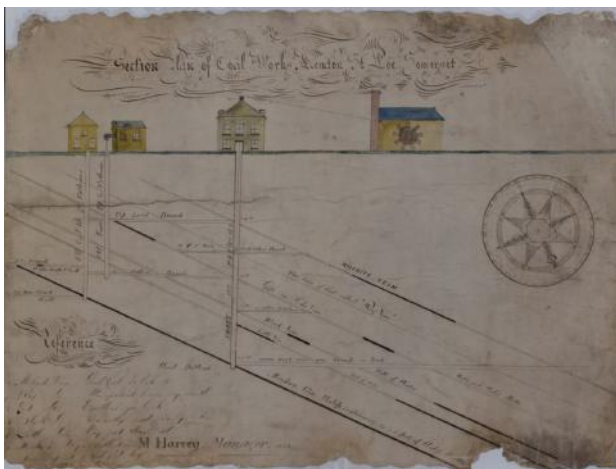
Cross-section of the coal workings at Newton St Loe showing the steep dip of the beds and access tunnels. From the Bath Record Office.
